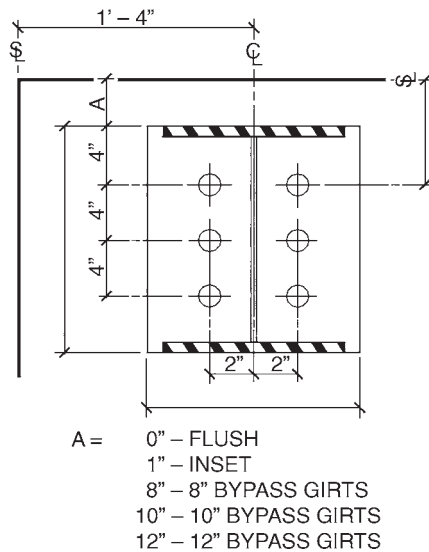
Base plate and anchor bolts for corner column of endwall rigid frame. (The number of anchor bolts is determined by design, but most likely is four.) (Nucor Building Systems.)
